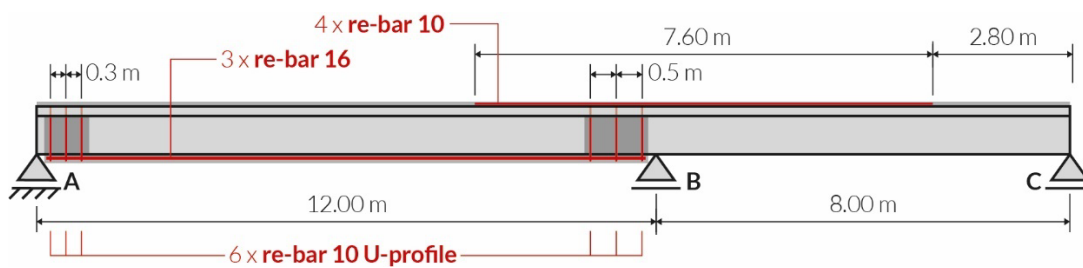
Sketch of strengthening works with re-bar longitudinal reinforcement and re-bar shear stirrups
